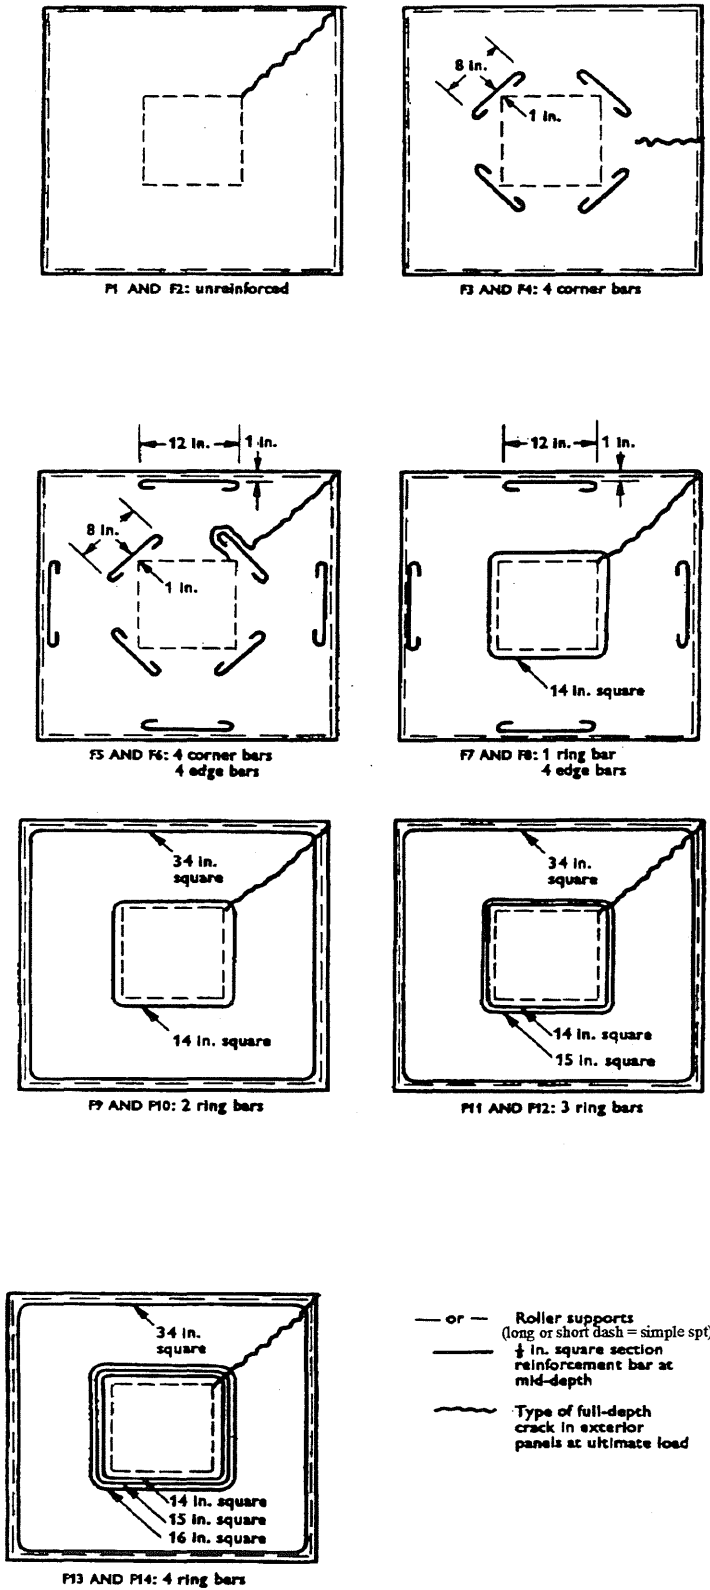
Positions of Reinforcement, Support Rollers and Full-Depth Cracks in Exterior Panels at Failure (Park, 1965)
